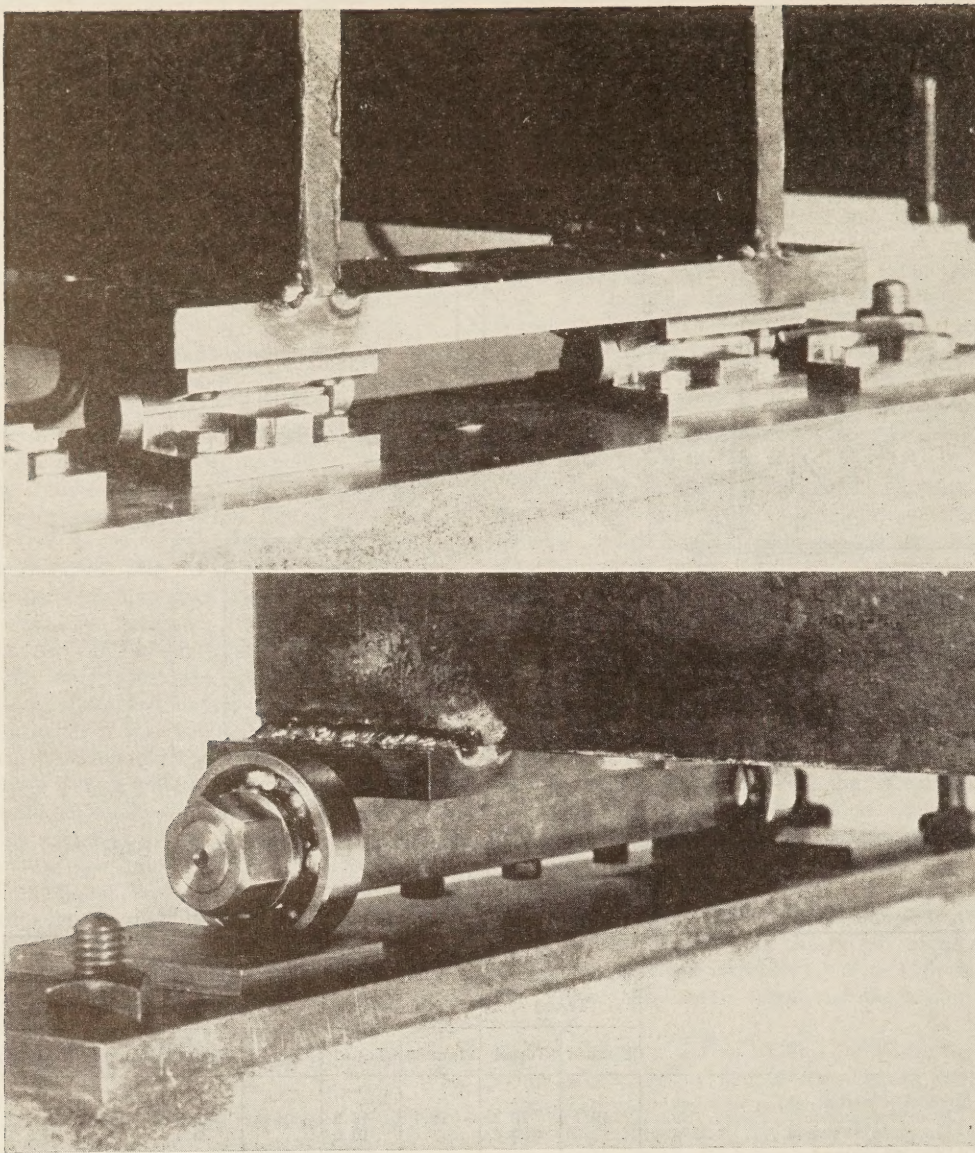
Rocker bearing (above) and wheel bearing (below) used to support the specimens. The H-section is shown here.
